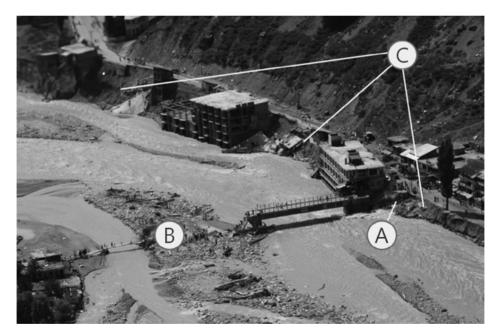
Monsoon flooding-triggered bridge and road damages in Pakistan (2010)
